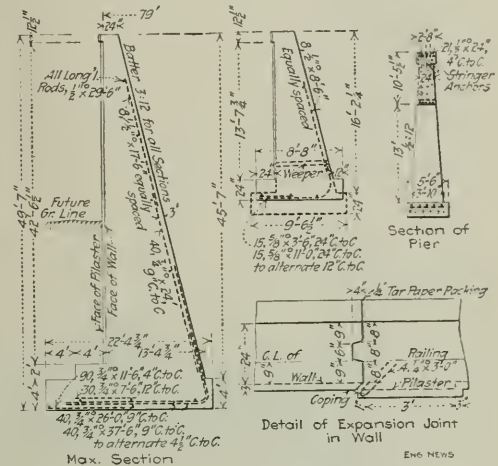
SECTIONS OF RETAINING WALLS AND PIERS OF UNION AVE. VIADUCT, ST. LOUIS, MO.
